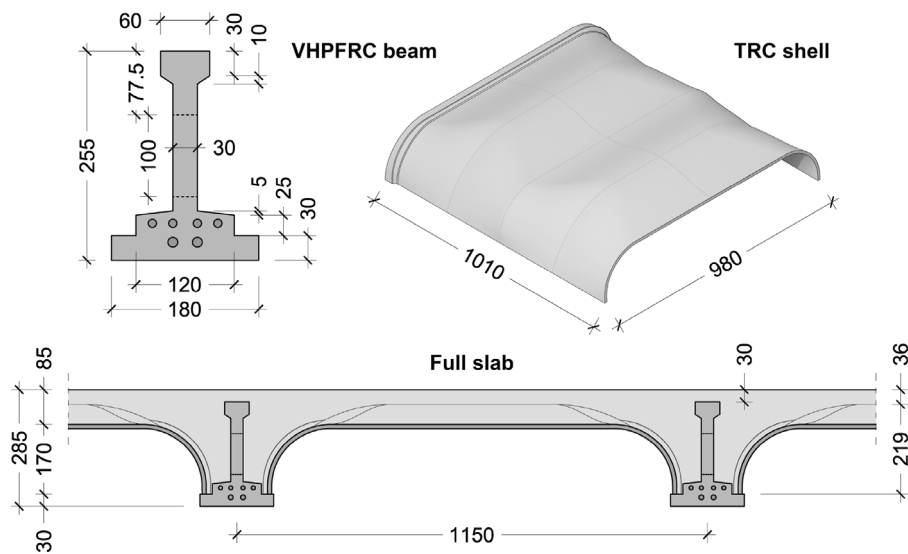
Details of the proposed slab system: VHPFRC I-beams, TRC shells and full slab section including the cast-in-place SFRC (measures expressed in mm).
